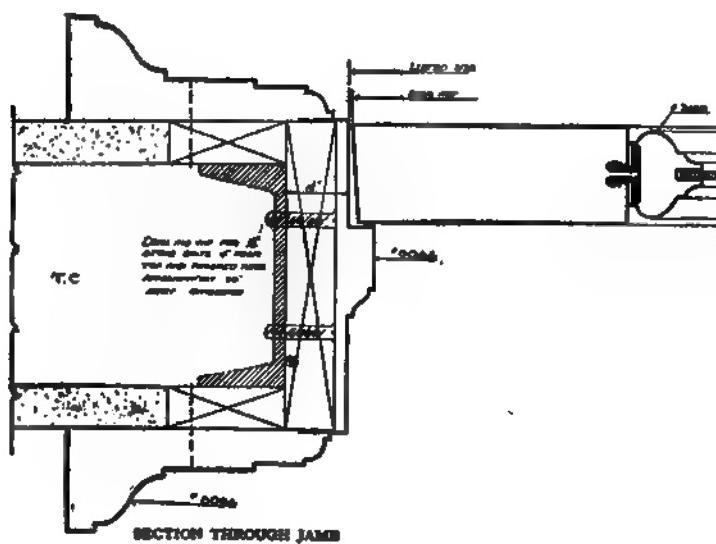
Hollow-Steel Trim and Door with Solid-Panel. Tile Partition. Channel-Buck.
